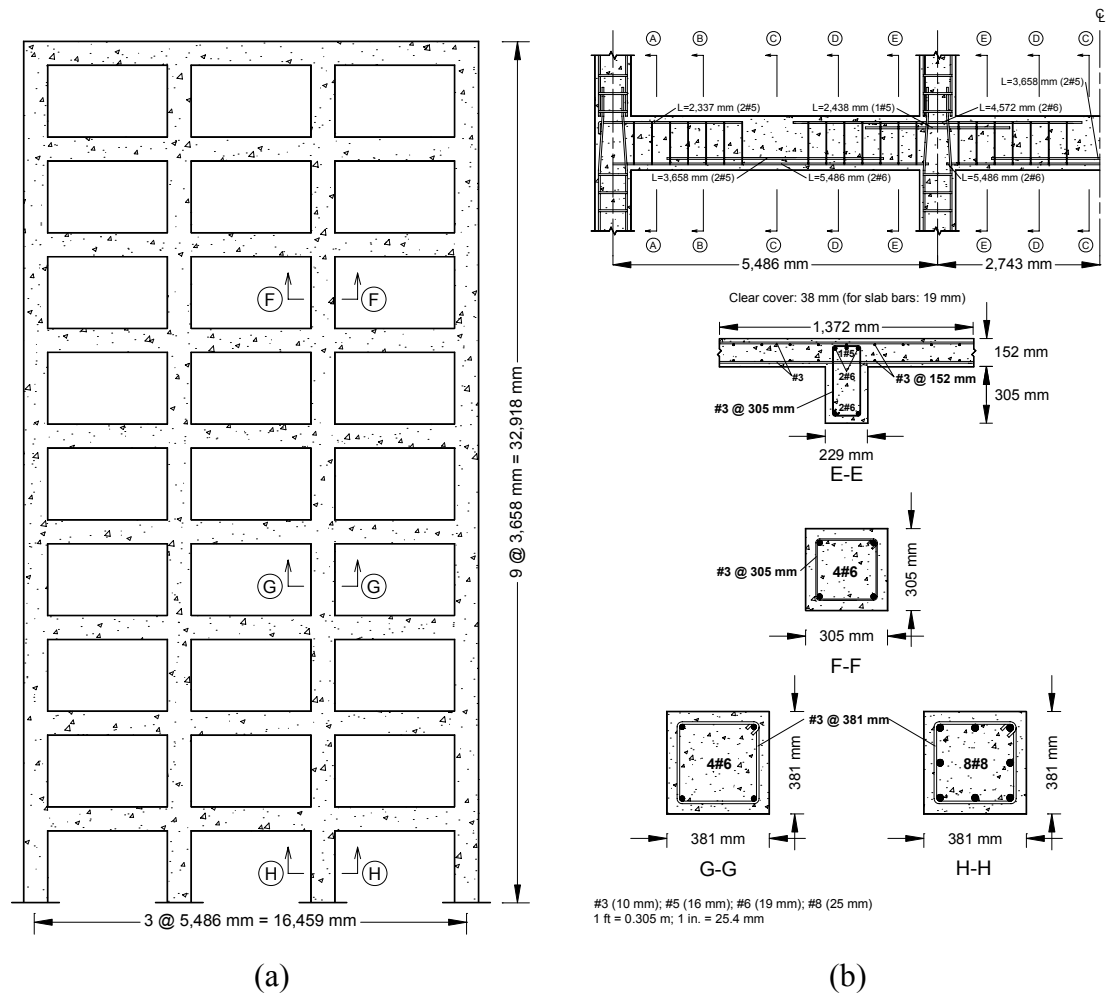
(a) Elevation and (b) beam and column reinforcing steel layouts; of the nine-story GLD RC frame.
